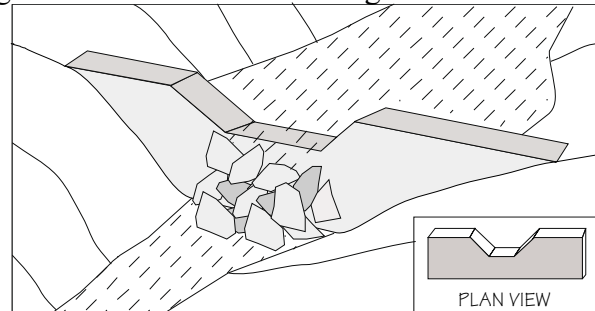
Waste concrete check dam. It should be a minimum of 4 inches thick; length and width vary to fit application.
